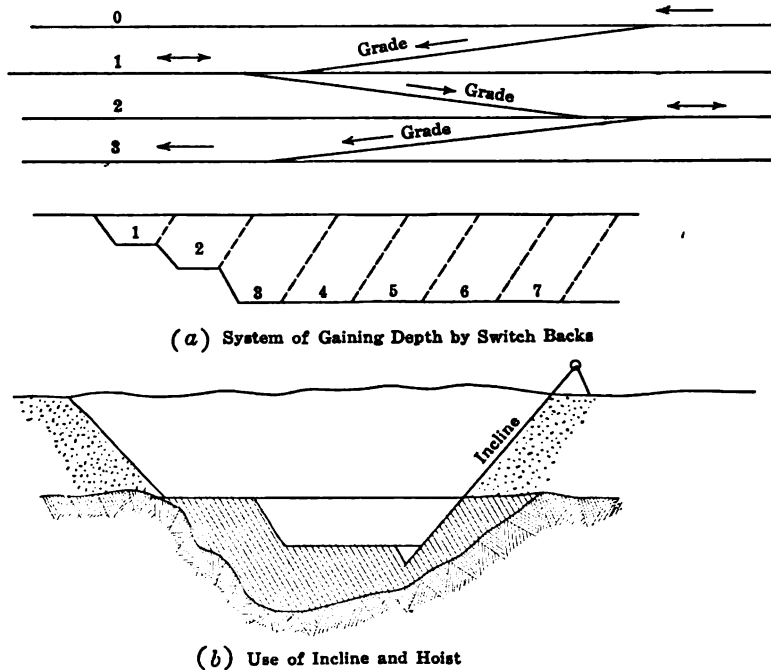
(a) Switchback system; (b) Incline and hoist.
